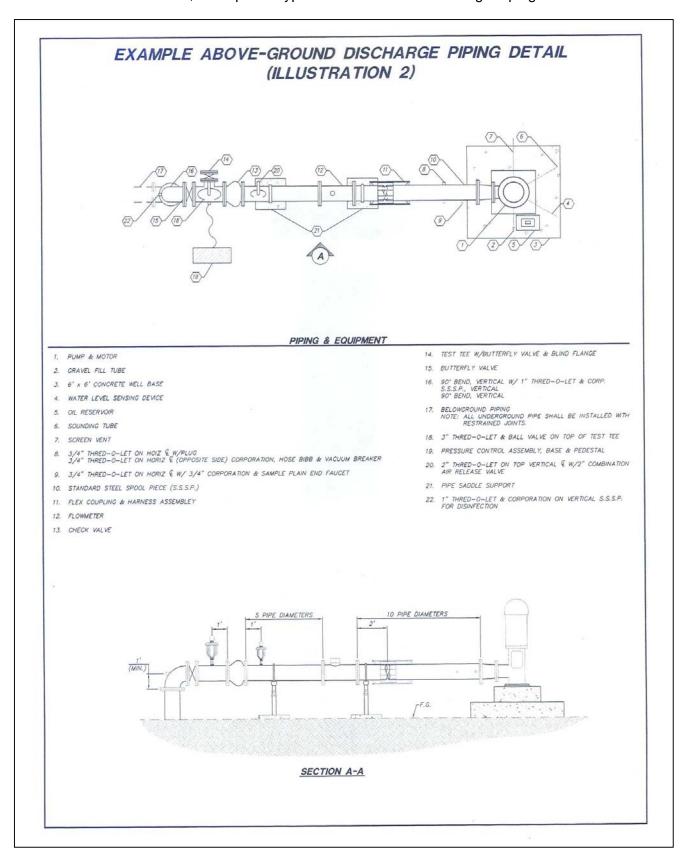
, Example of Typical Above-Ground Discharge Piping Detail
